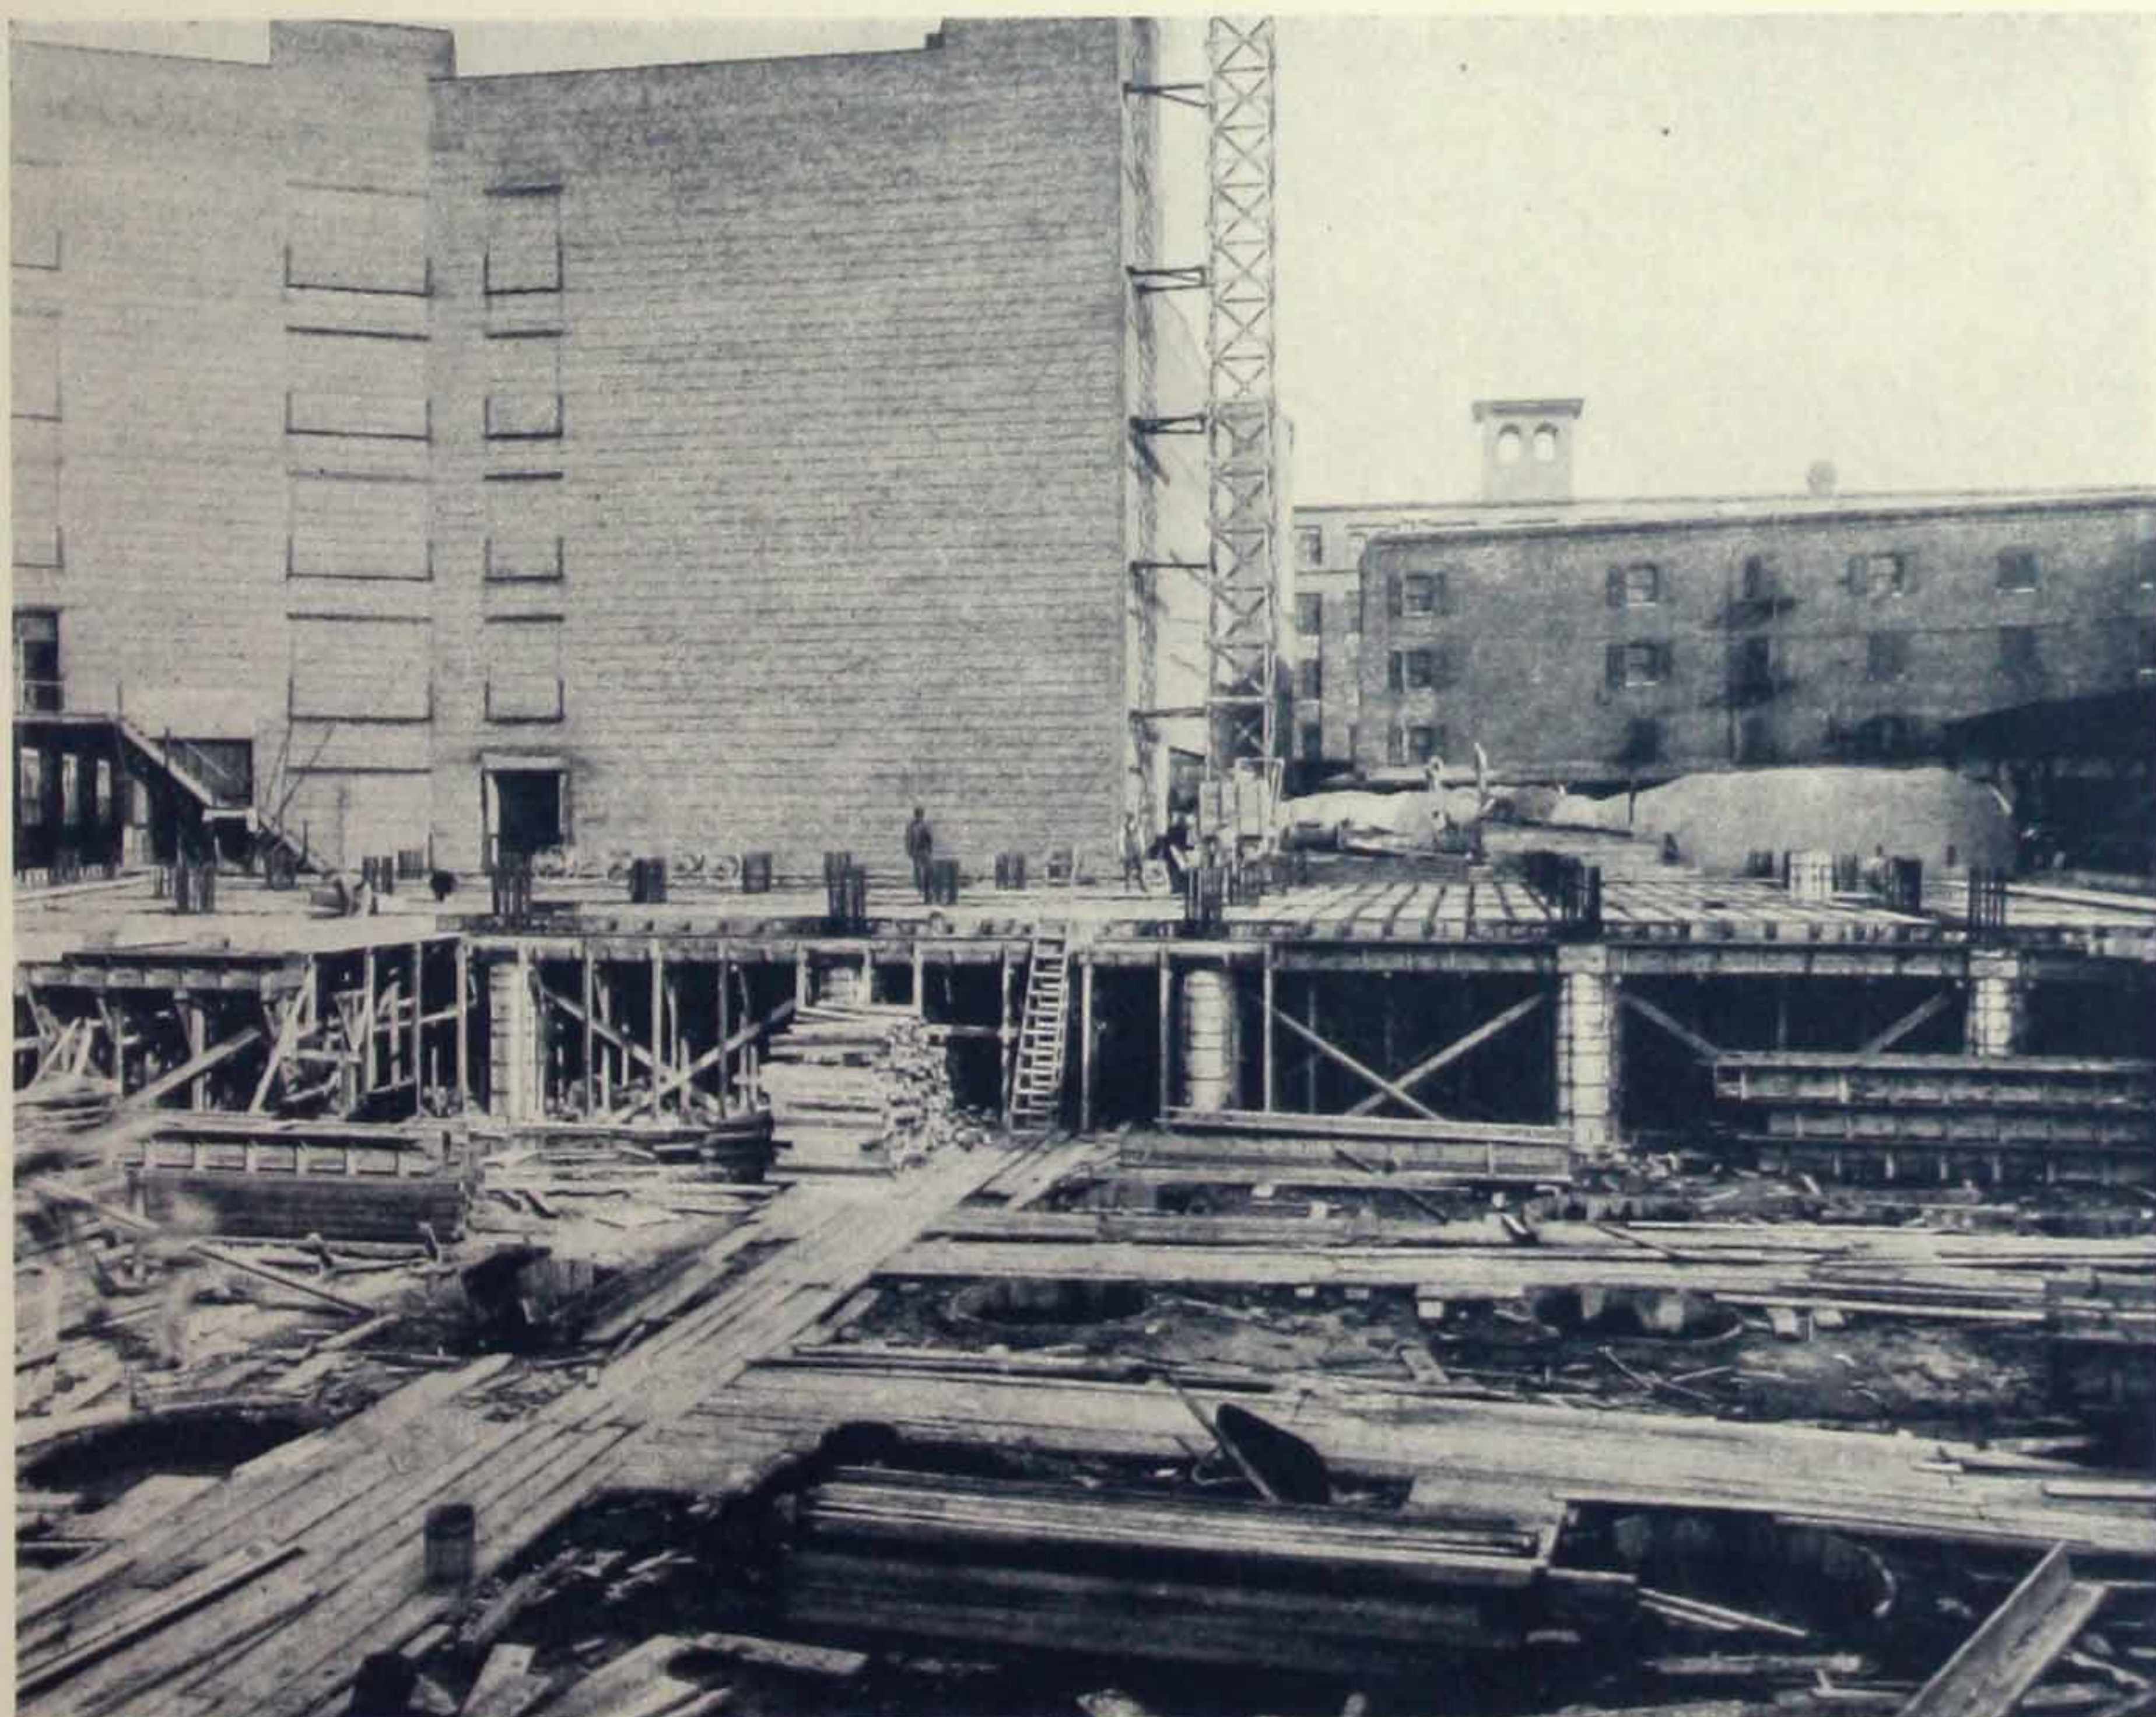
BLAW CIRCULAR COLUMN FORMS ON BEAM AND GIRDER CONSTRUCTION
